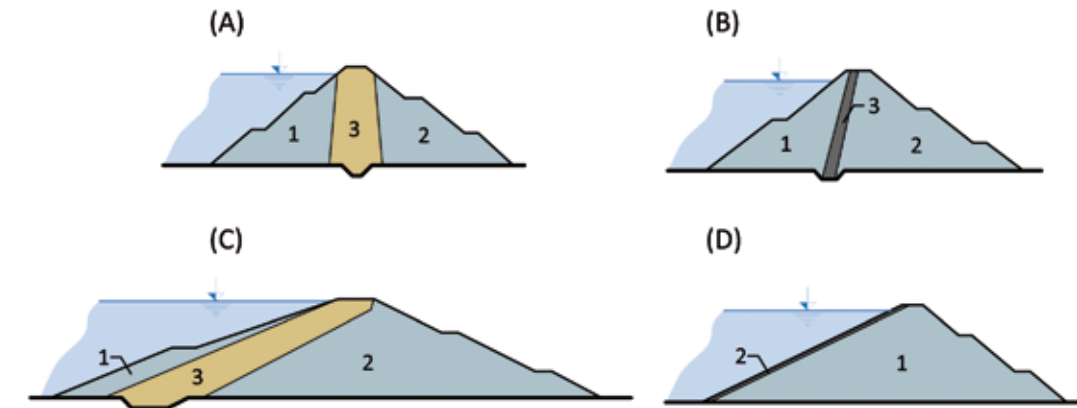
Basic types of rockfill dams: (A) rockfill with earth hearting zone: 1 – upstream shoulder, 2 – downstream shoulder, 3 – earth impervious zone; (B) rockfill with asphalt concrete hearting zone: 1 – upstream shoulder, 2 – downstream shoulder, 3 – asphalt concrete impervious zone; (C) rockfill with earth upstream impervious zone: 1 – upstream shoulder, 2 – downstream shoulder, 3 – earthfill seal; (D) rockfill with inclined upstream asphalt concrete impervious zone: 1 – shoulder, 2 – asphalt concrete upstream impervious zone. Diagram by Radka Račoch, 2021 (modified according to: Broža et al., 2005).
